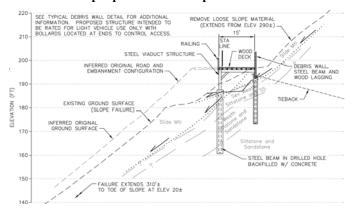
C. Conceptual design alternative for Station 176 showing a steel viaduct structure supported on pile foundations with tieback anchors to allow landslide debris to flow underneath
